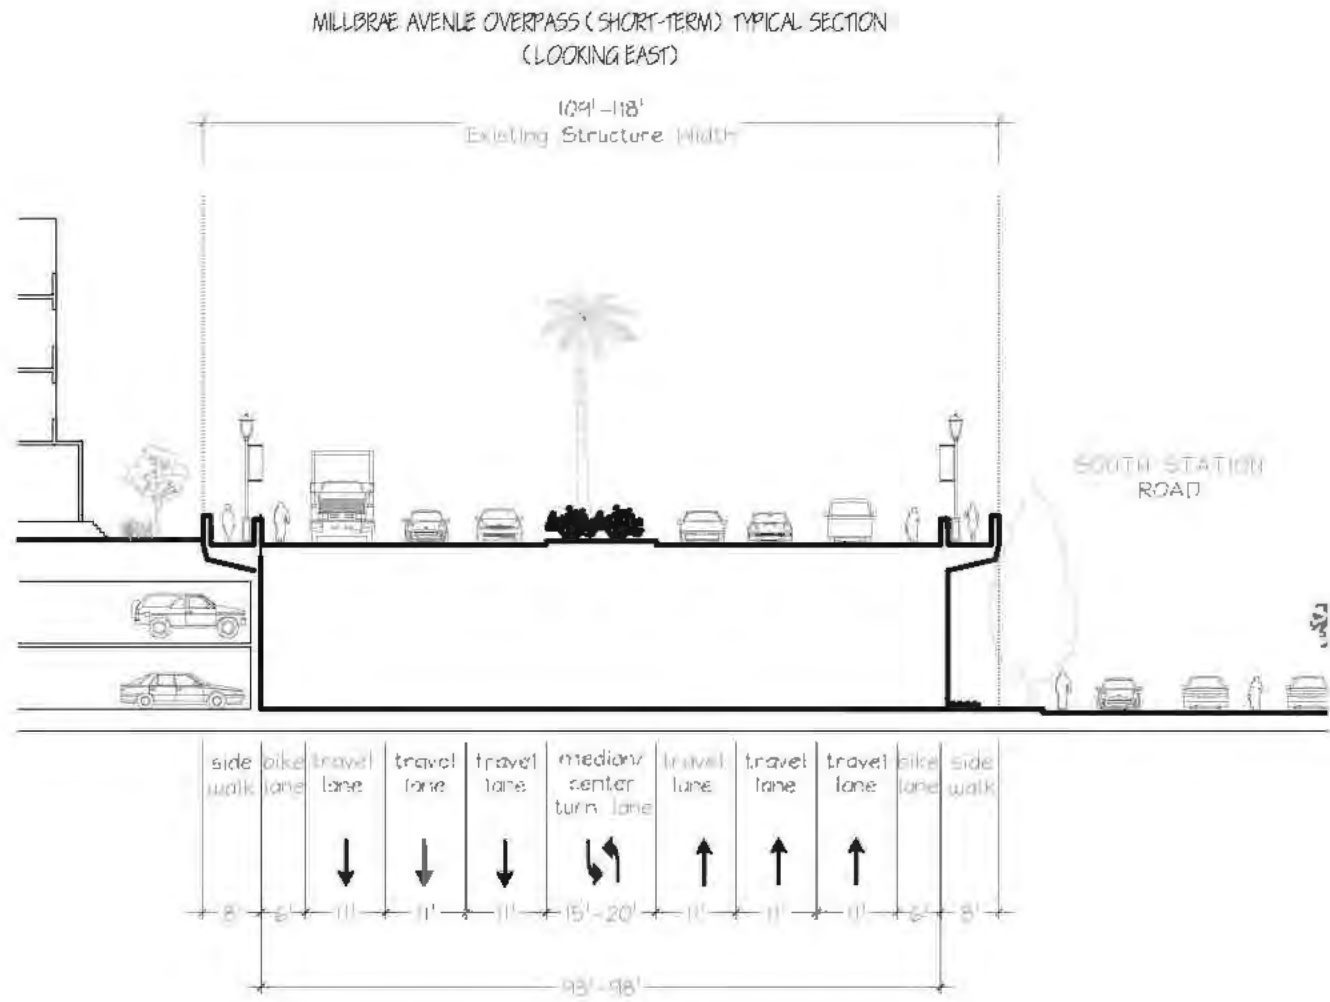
Millbrae Avenue Overpass (Short-Term) Typical Section
